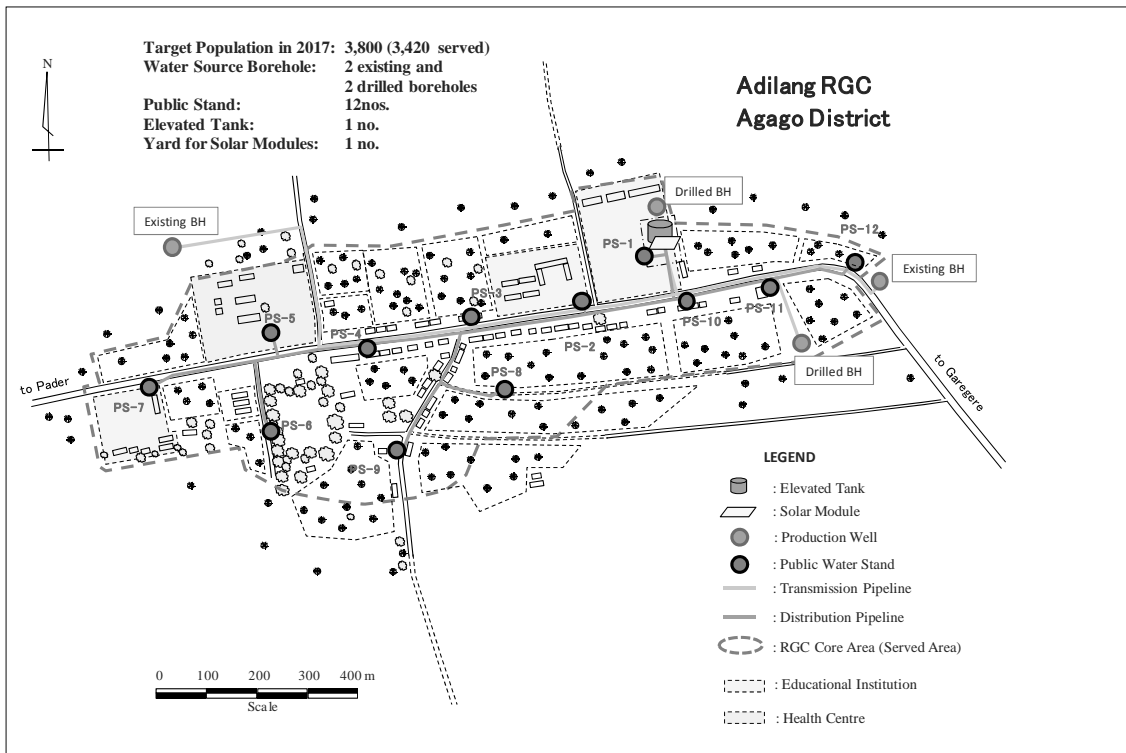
General Plan of Piped Water Supply Facility (Adilang RGC)
